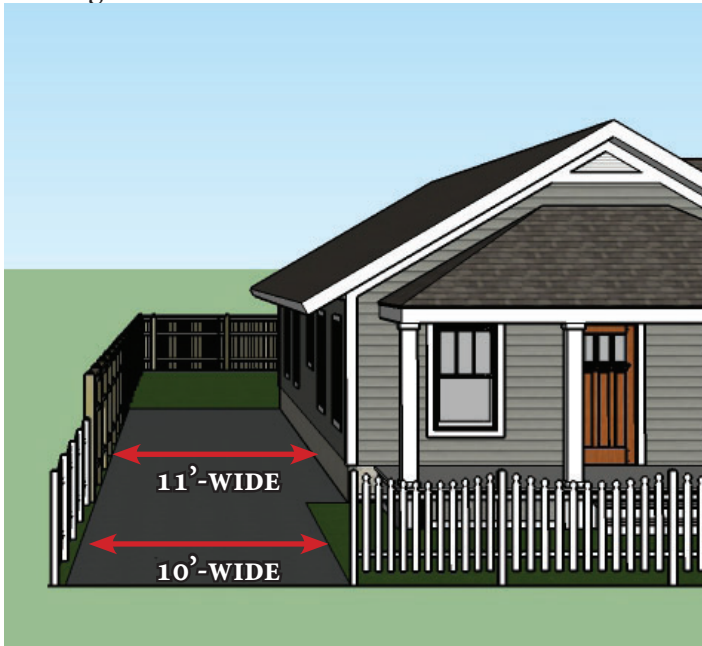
For interior lots, driveways adjacent to the house and terminating in parking pads must be 10'-wide or less from the street to the front of the dwelling and then can expand to 11'-wide or less to be considered under the ACoA process. The driveway and parking pad may be located on either side of the dwelling, but any elements directly in-front of the dwelling or in the rear yard would require a CoA.
